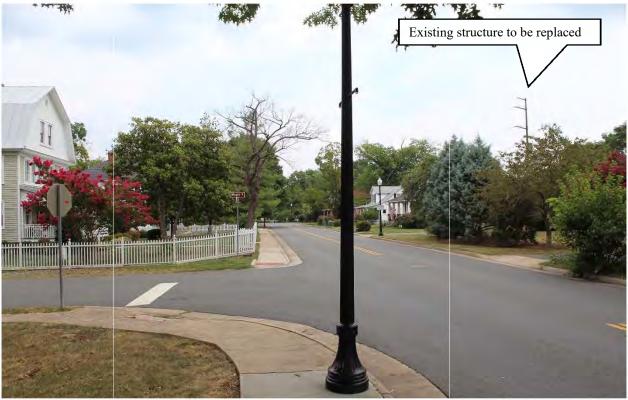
Photo location 12- View from Center Street at Maple Street (Project structure visible), facing east.
